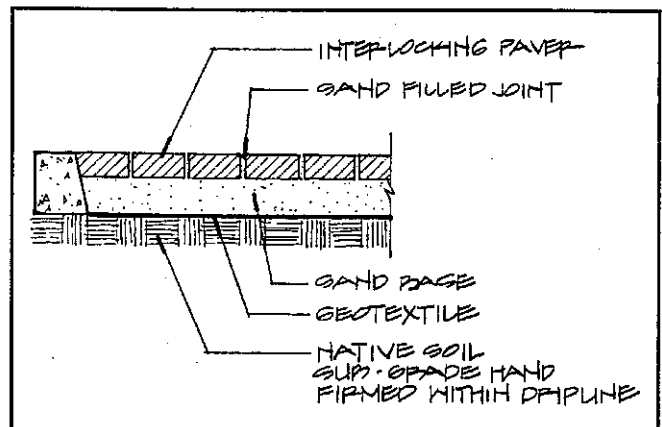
Brick or interlocking pavers on sand often are recommended as pervious paving. Use of geotextile under the sand and hand-firmed subgrade can minimize root impacts.
